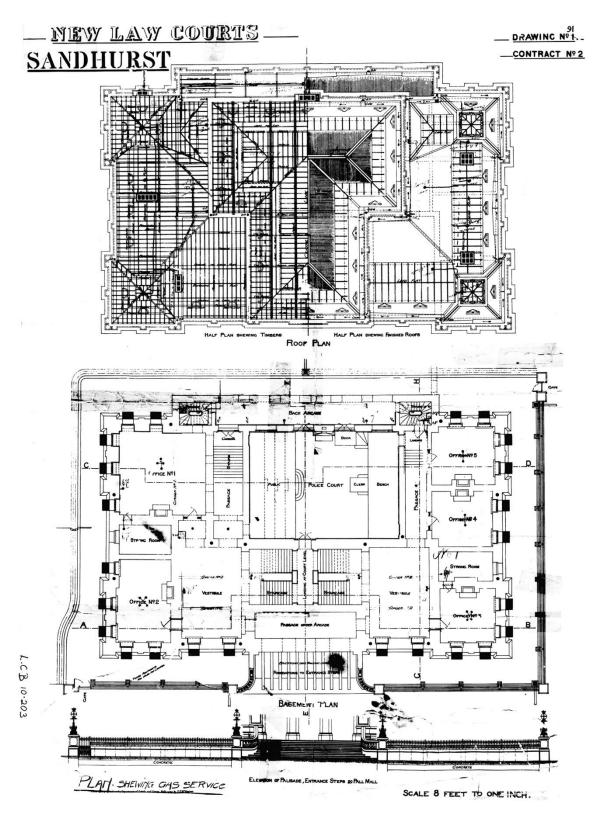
New Law Courts Sandhurst, Drawing 91, Contract No. 2 Source: Public Works Department, PROV LCB 10.203
